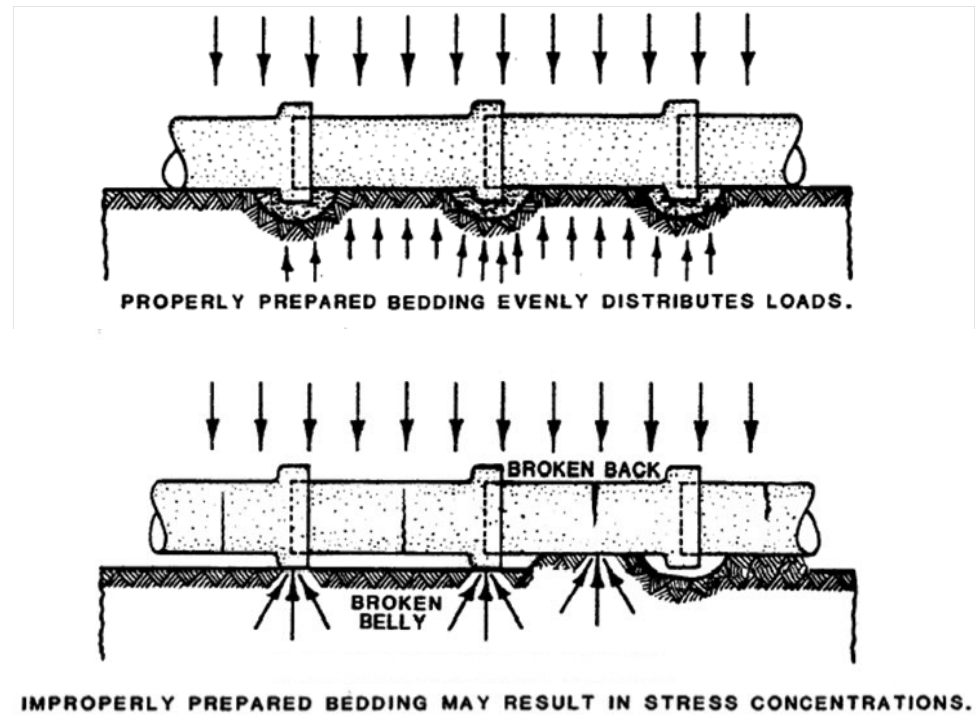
Transverse Cracks in Pipe Culvert
